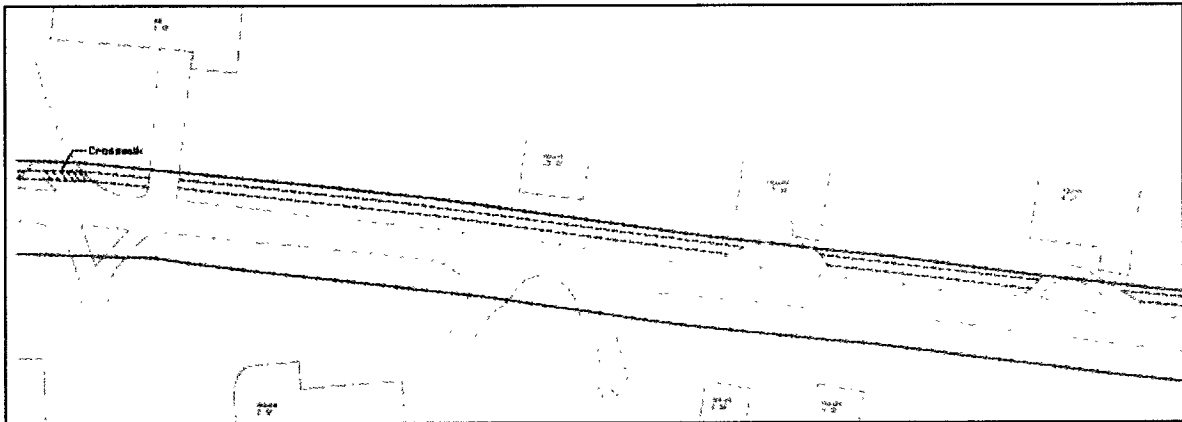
Proposed Sidewalk Alignment - Section 2 ( Moscow Woods Road to Village Edge)
